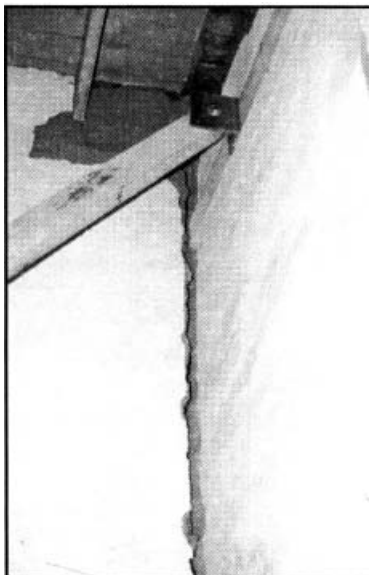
Separation at the interface between perpendicular walls. The wall to the right is the south wall of Room 9. The clean break between these two walls indicates they were not interconnected at the joint.
